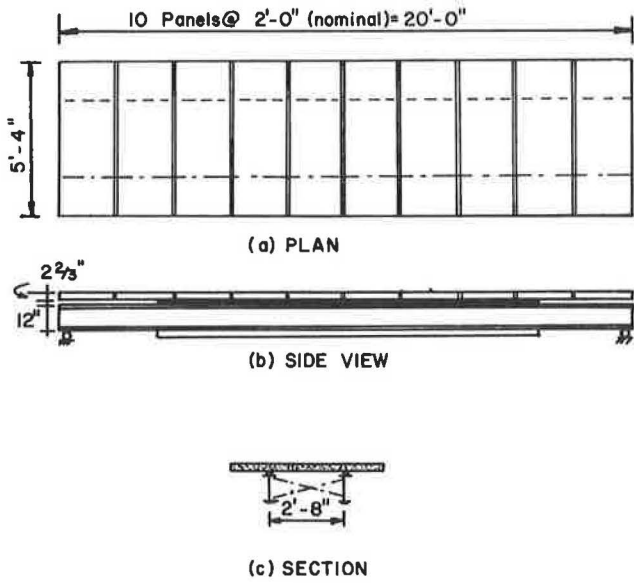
Layout of laboratory model: (a) plan view, (b) side view, and (c) typical section.
